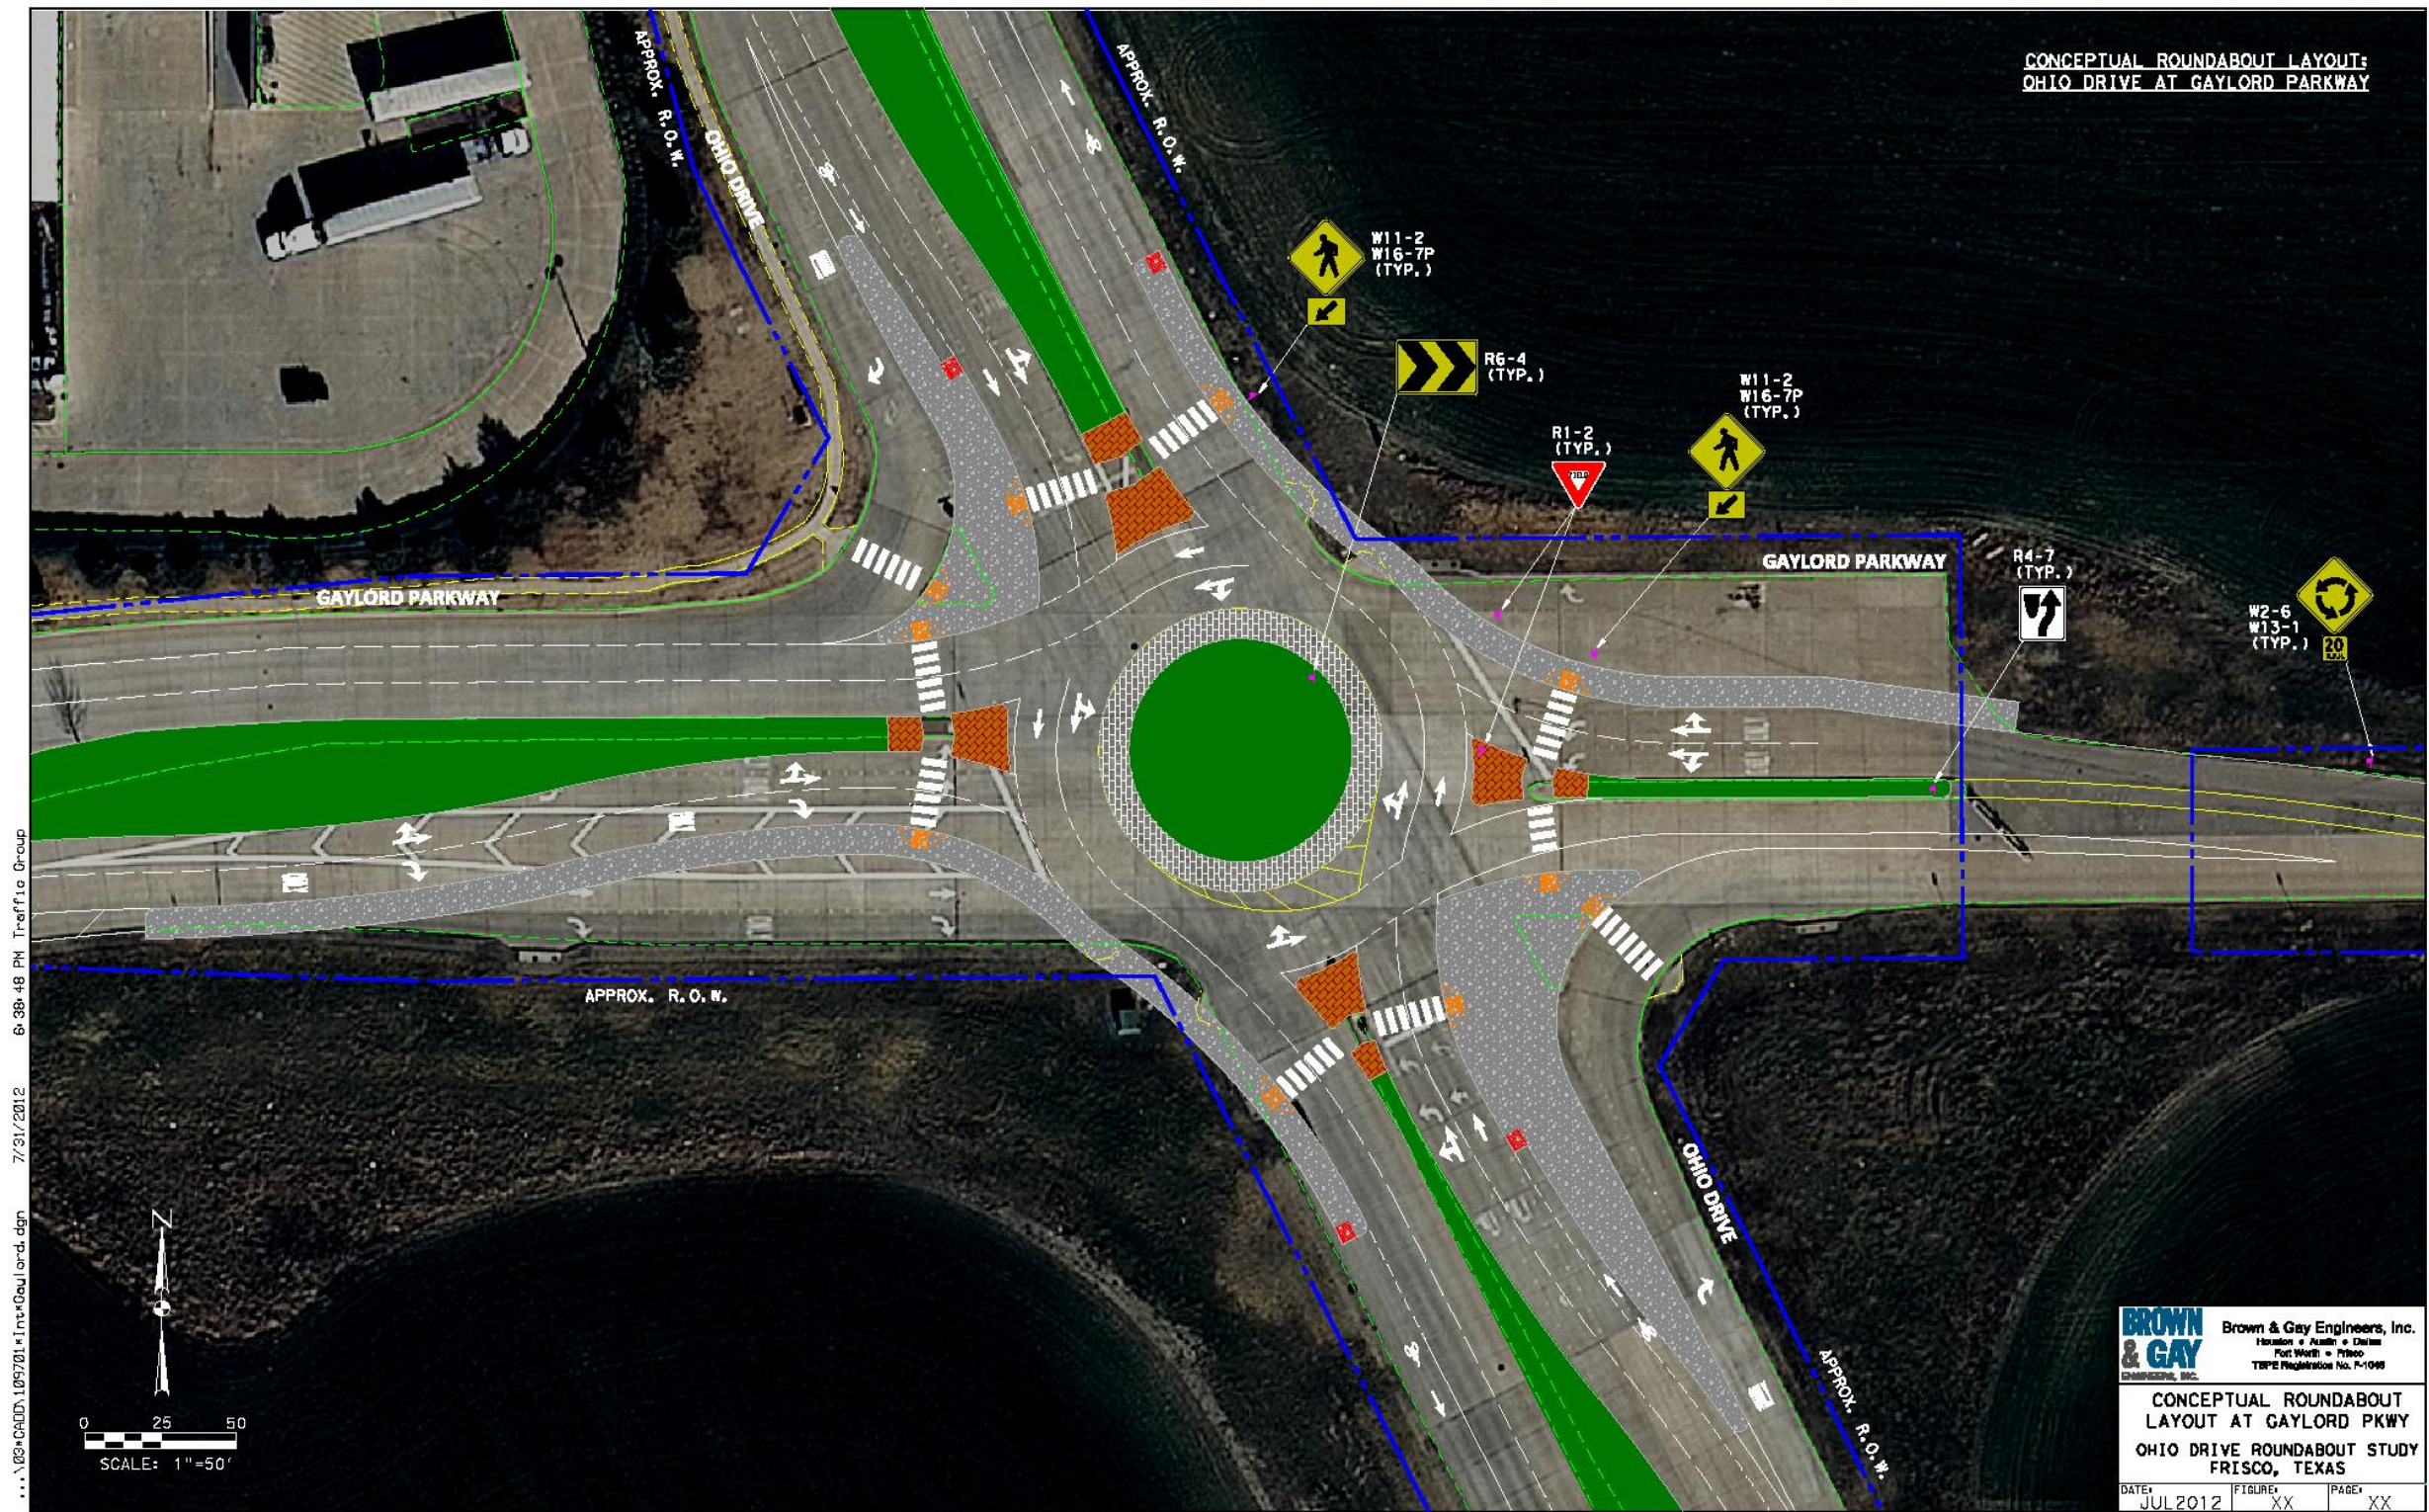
Proposed Roundabout: Ohio Drive at Gaylord Parkway
